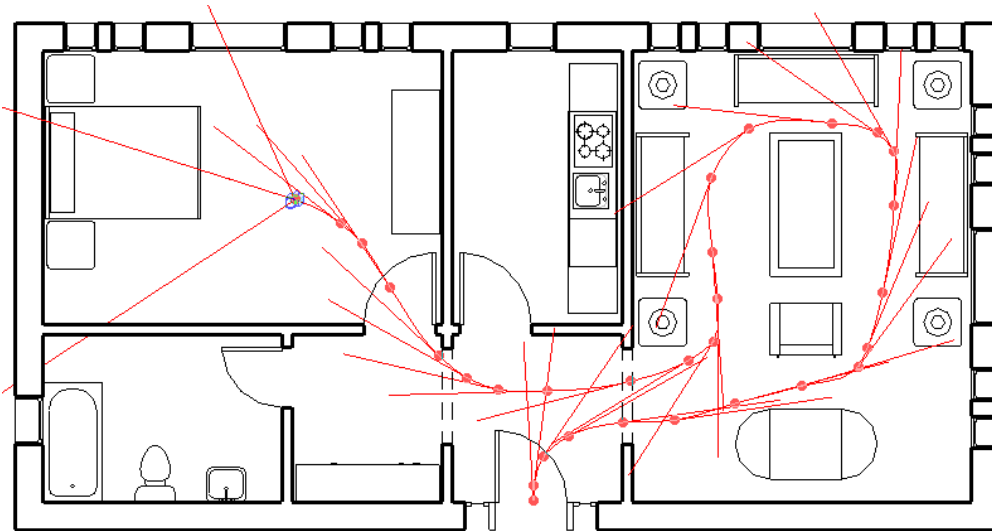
Sketch plan showing the walkthrough path for the Apartment 1 project
